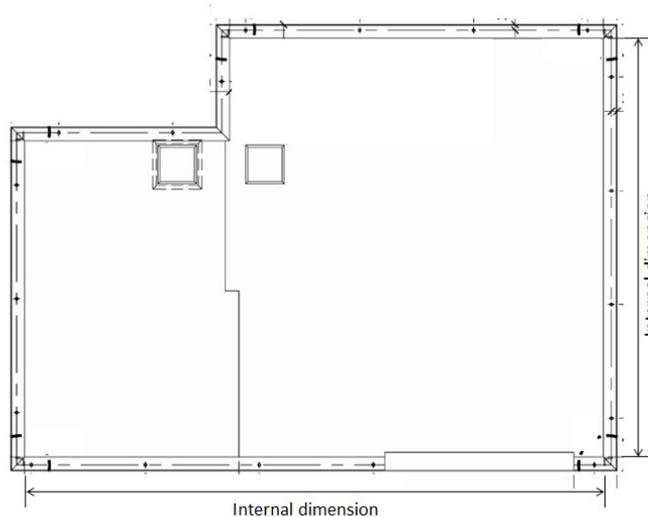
Plan of a prefabricated bathroom unit and its internal dimensions
